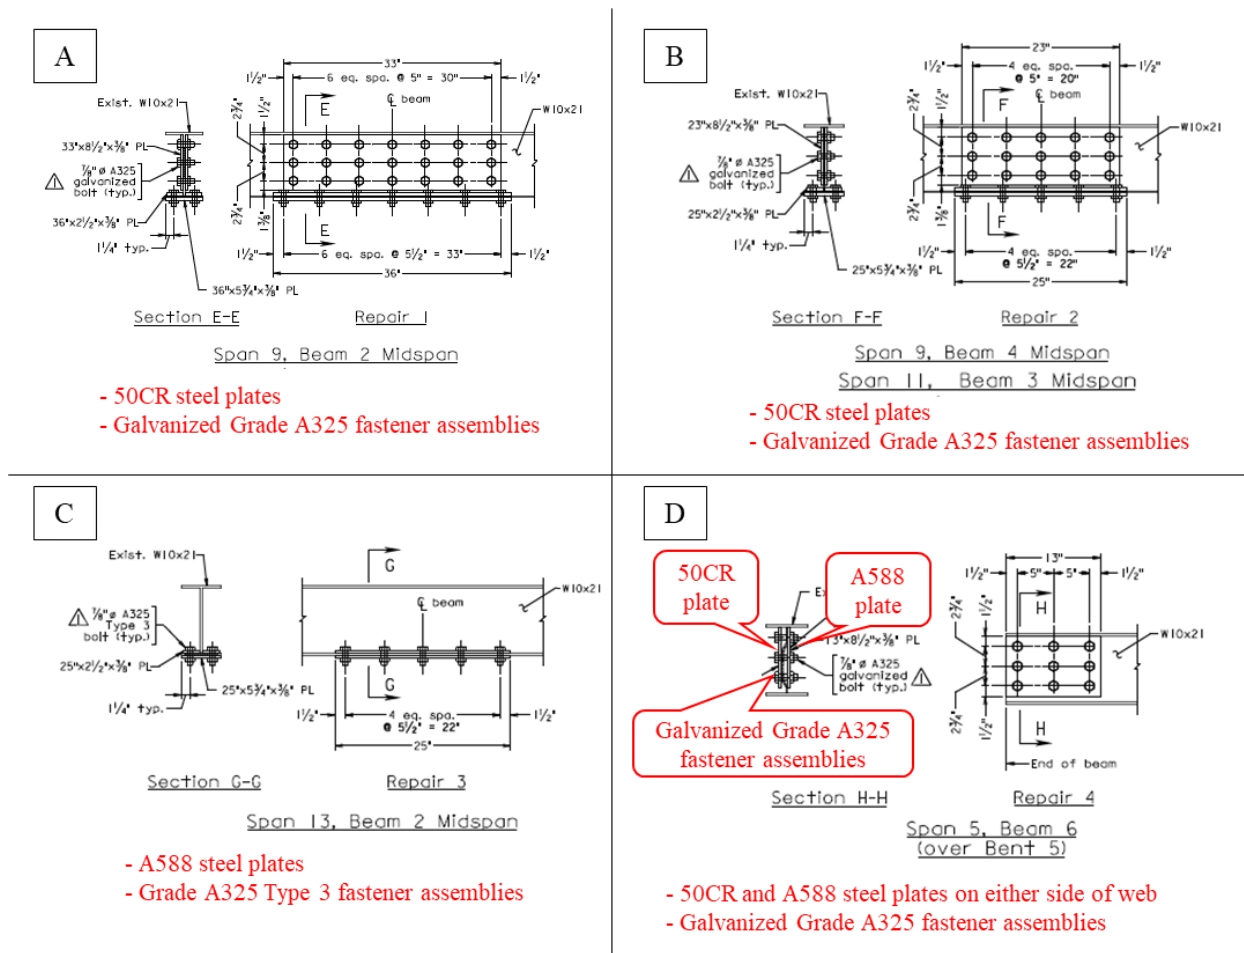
Bolted Repair Details for the Onancock Bridge Indicating Type of Steel Plates and Fastener Assemblies Used: (A) Repair Type 1; (B) Repair Type 2; (C) Repair Type 3; (D) Repair Type 4.
